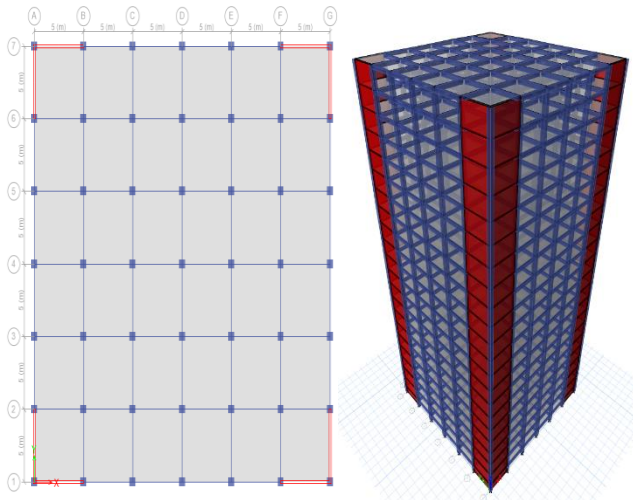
Plan and 3D View of Shear Wall Structure Model 3
